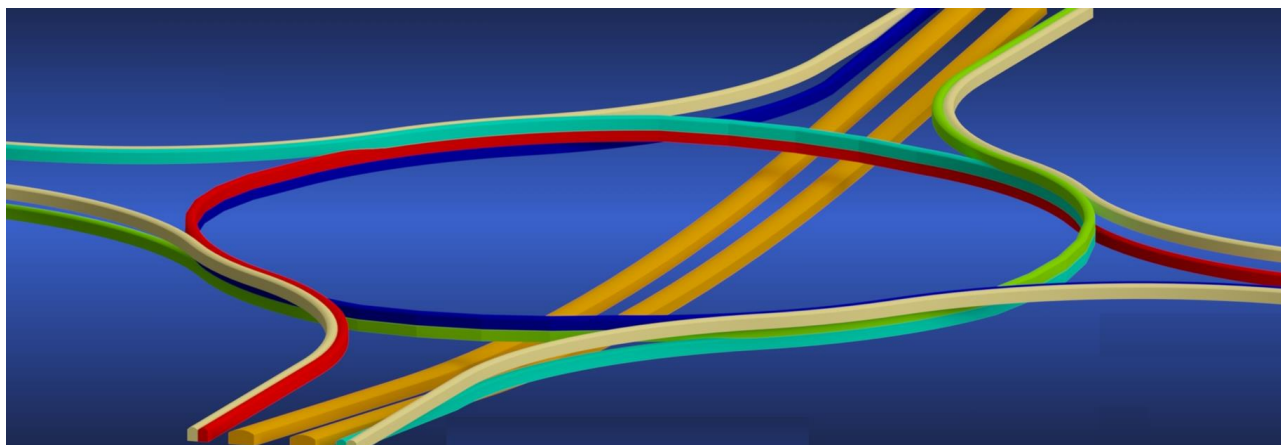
A helix that allows multiple entry and exit ramps without complex lane merges and underneath the one supported roof
